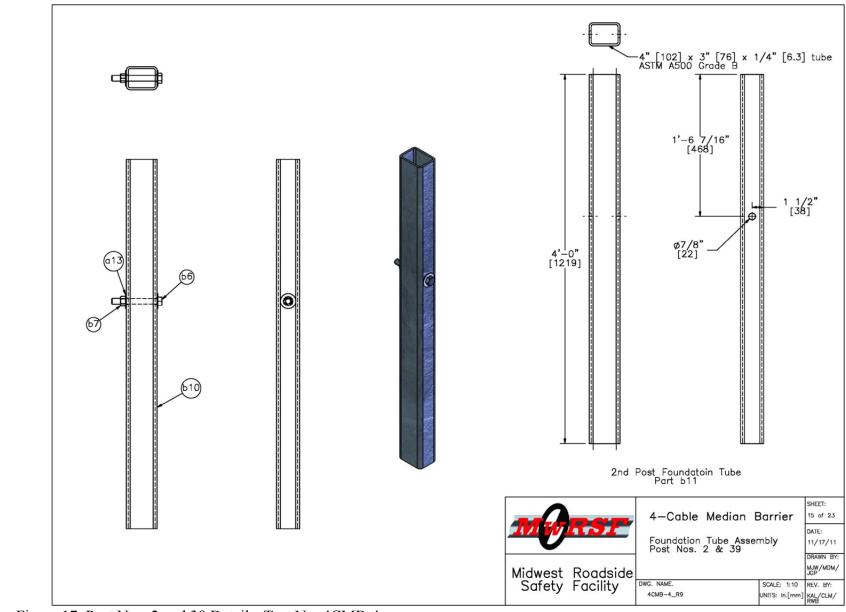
Post Nos. 2 and 39 Details, Test No. 4CMB-4
